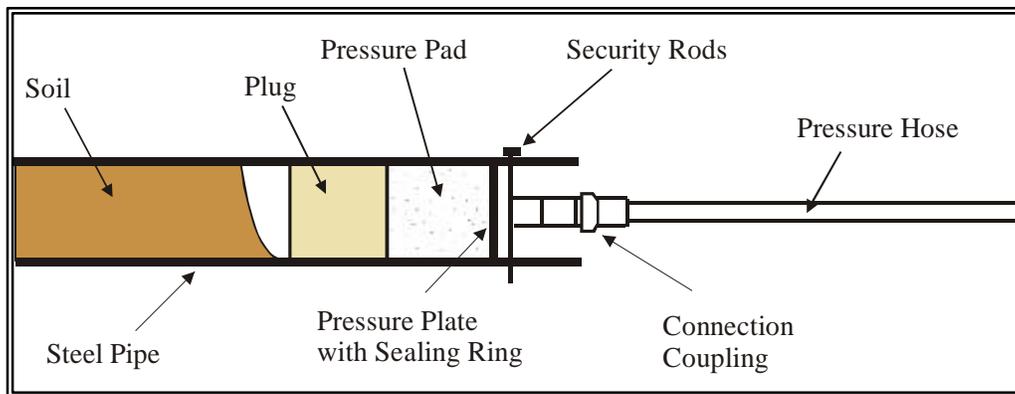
Spoil removal with compressed air (Mole Engineering, UK)
